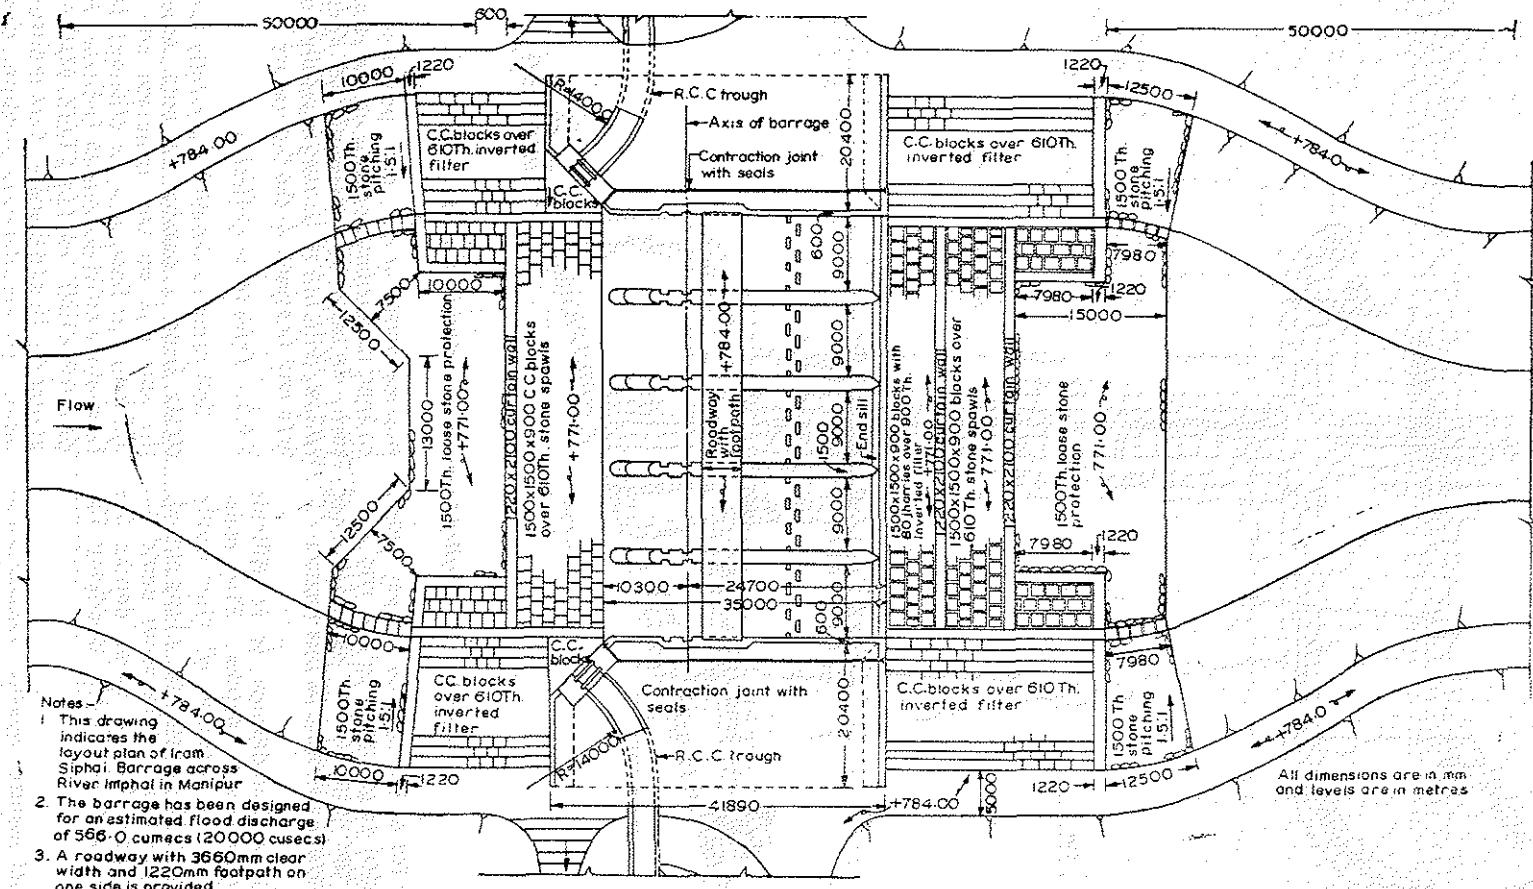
Detailed Layout plan of Iram Siphai Barrage.
